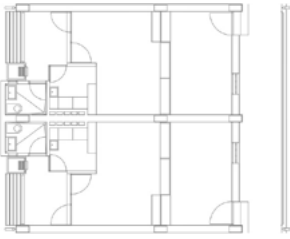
Resettlement Housing of Ilha Verde Area. Unit's Floor Plan. Own elaboration based on CD-FAUP.
